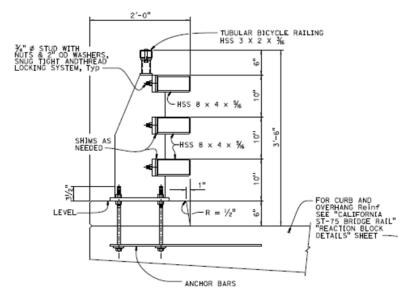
Typical Section and Dimension for the ST-75 Bridge Rail
